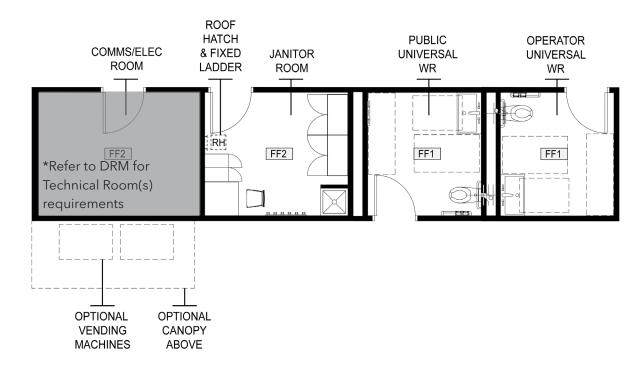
Typical Washroom & Ancillary Facilities Elevation Diagram
